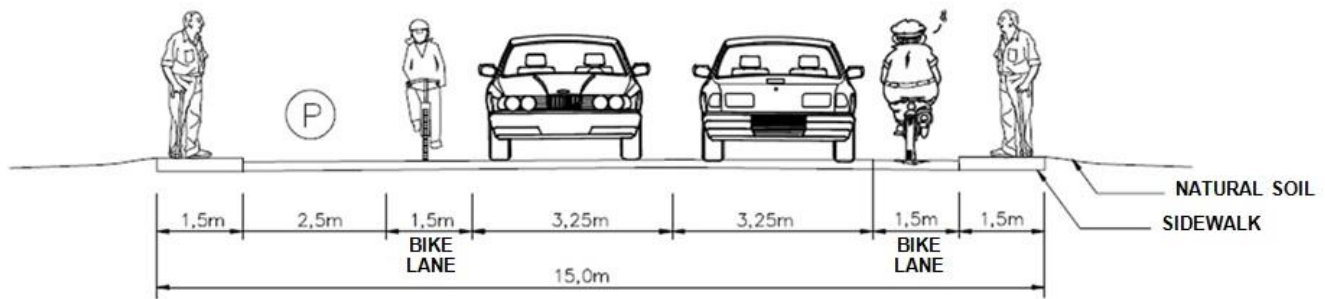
Proposed Cross-section for Old Chelsea Road – West of Highway 5
